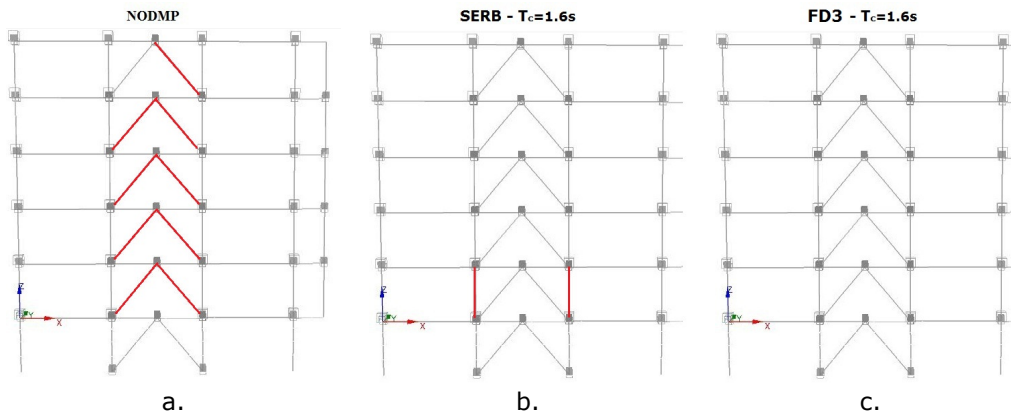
Plastic hinge location at ULS: a) No damper; b) SERB damper; c) FD3 damper (soft soil)
